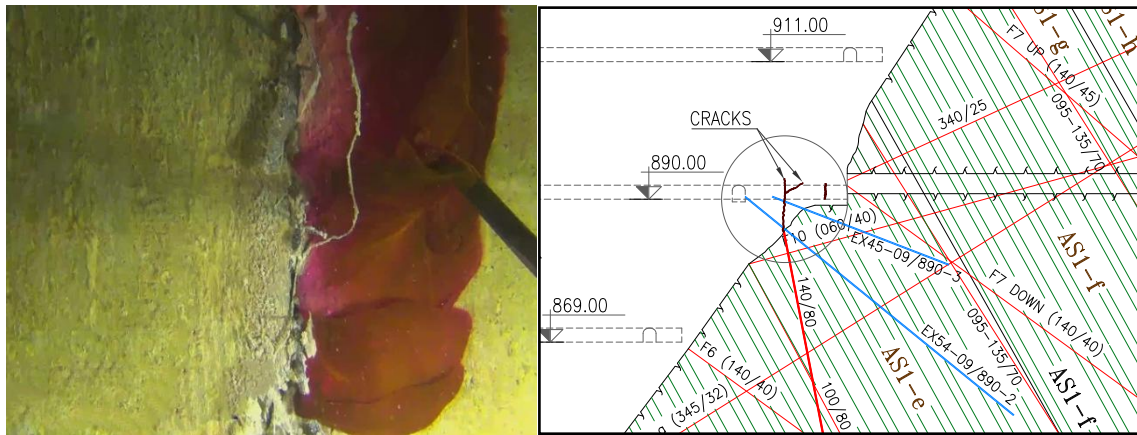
Dye test of the Crack in block 9 and geological section through the dam abutment close to blocks 7 & 9
